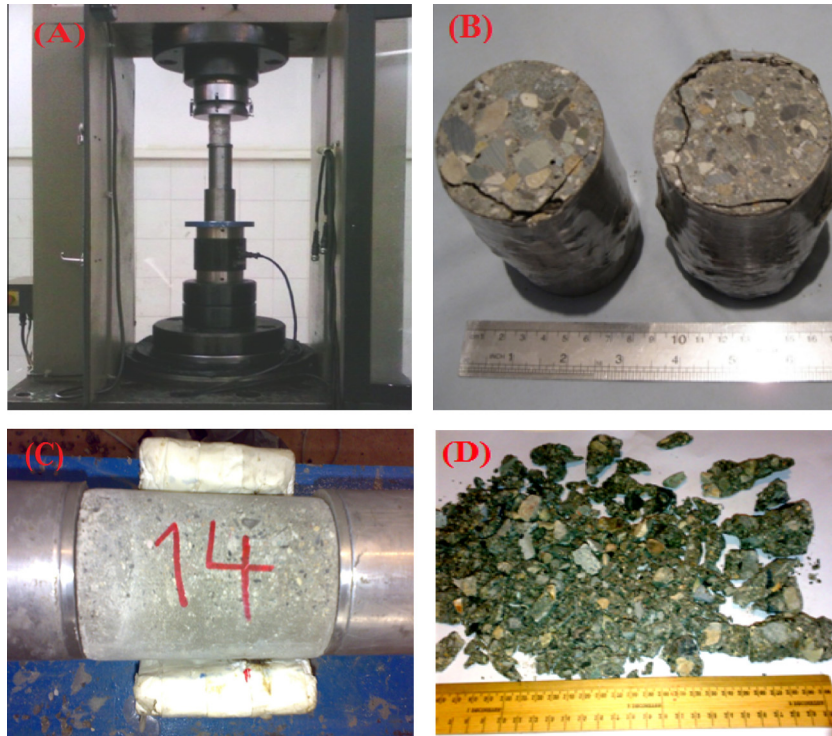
(A) Typical concrete specimen before quasi-static test, (B) failure pattern after quasi-static test, (C) typical concrete specimen before SHPB test, (D) failure pattern after SHPB test.
